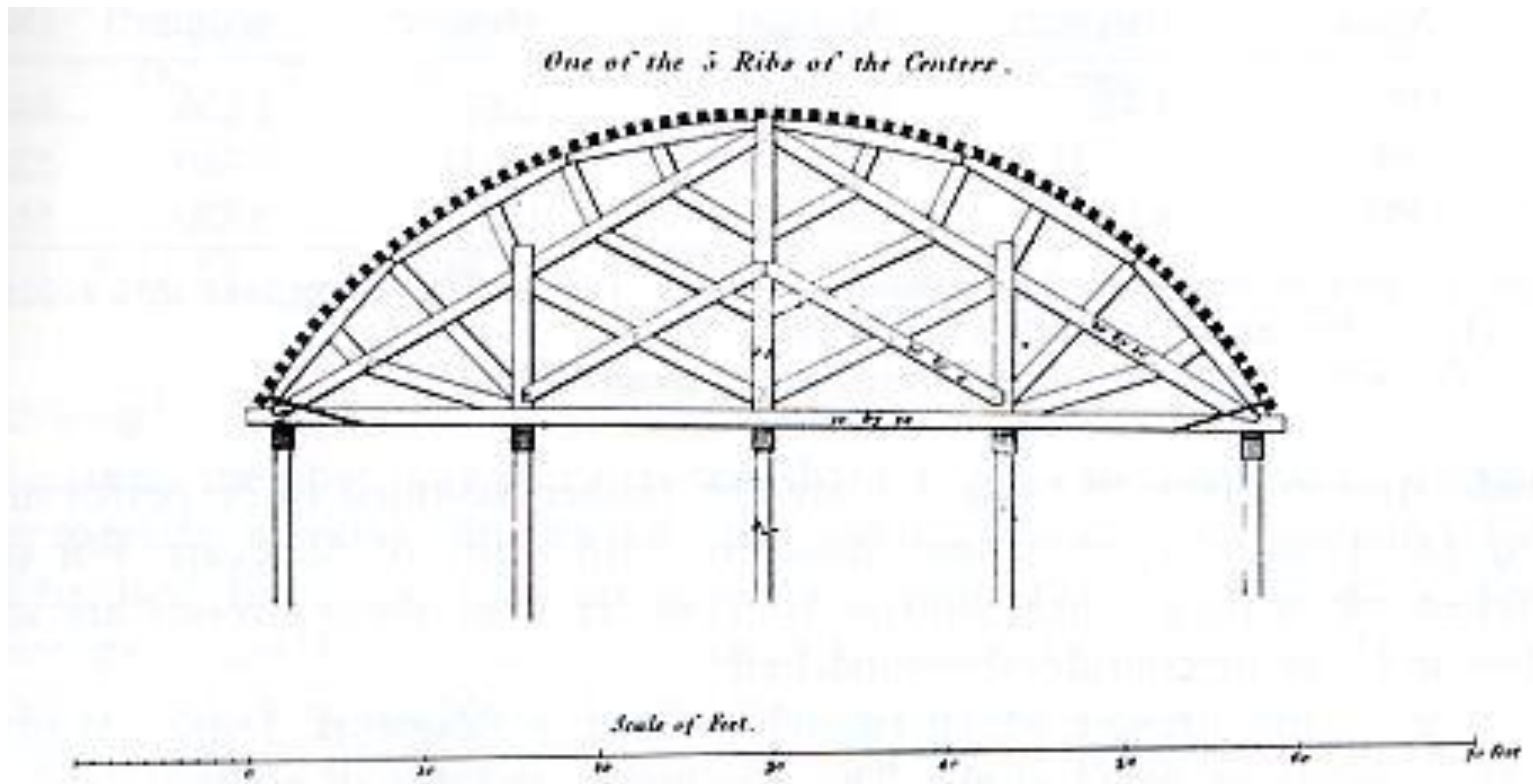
Centering for masonry Bridge over the Tweed at Coldstream, 1866 (Irwin and Sibbald, 1983)
